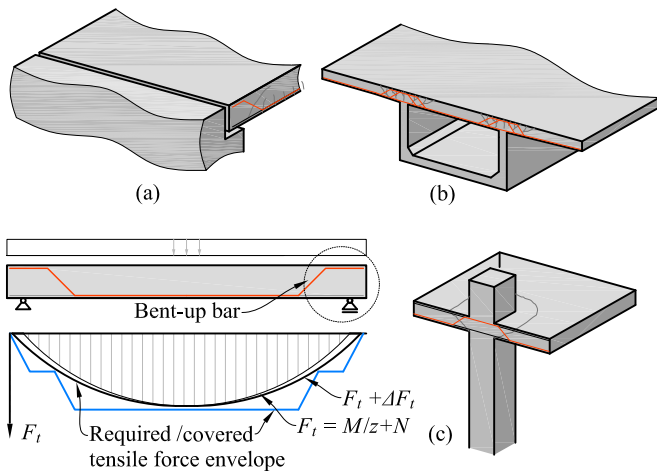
Typical applications of bent-up bars: (a) slab bridge and design principle of bent-up bars in RC members; (b) deck slab of a box girder bridge; (c) punching of a floor slab.
